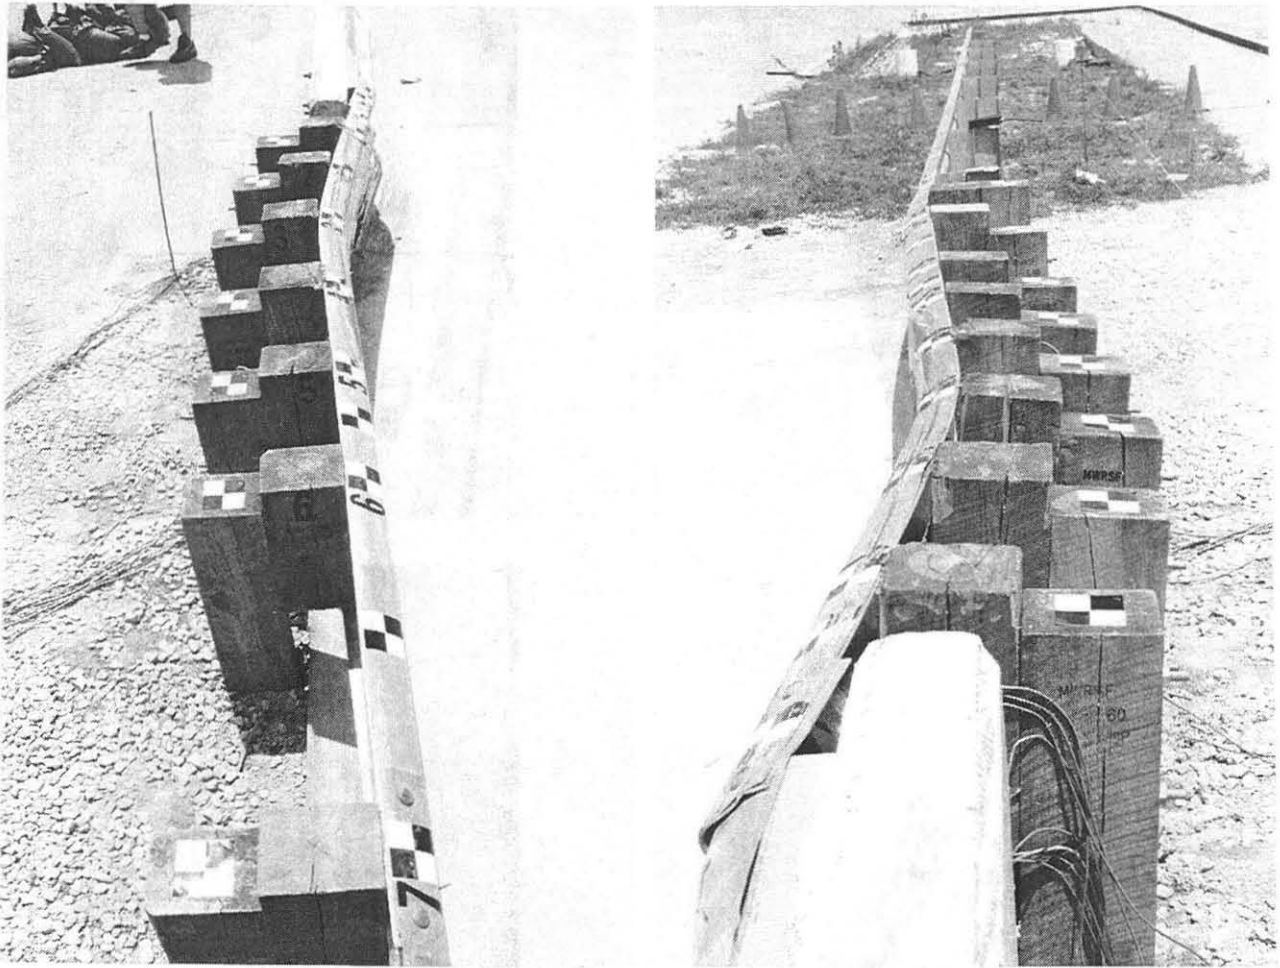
Barrier Damage, Test ITNJ-3 (Design No. 3)
